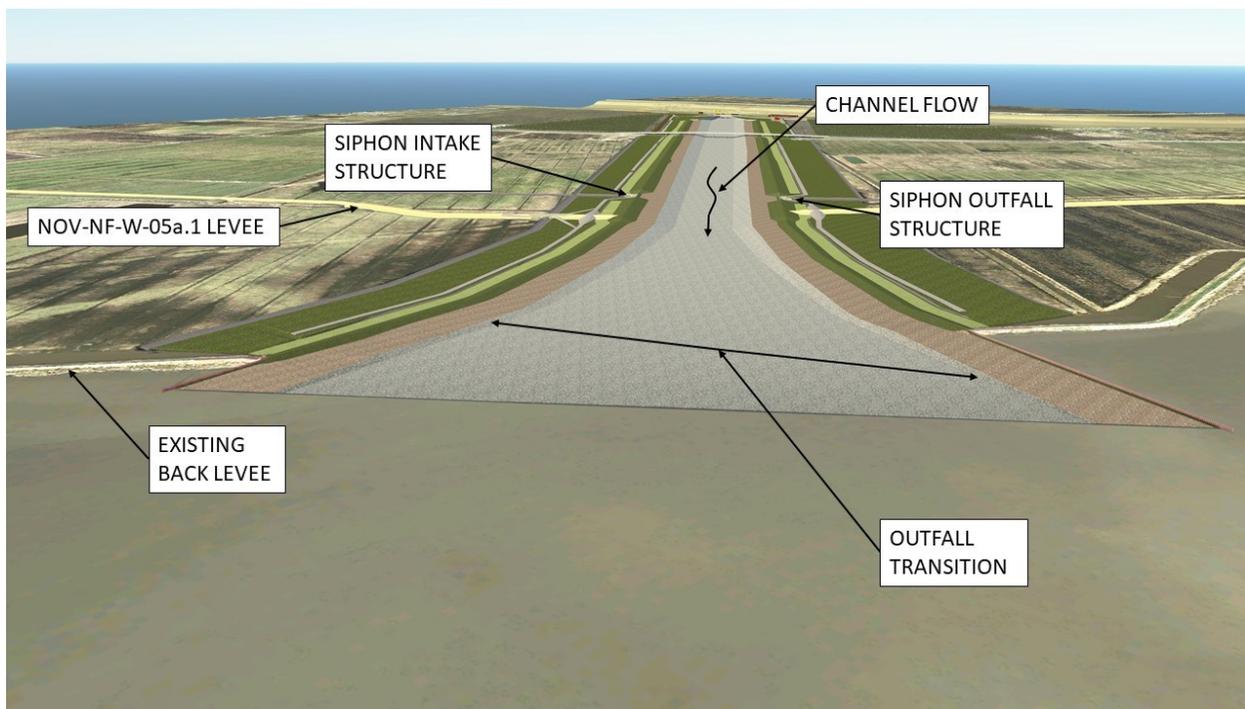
Proposed Project Outfall Transition Feature in the Barataria Basin.
